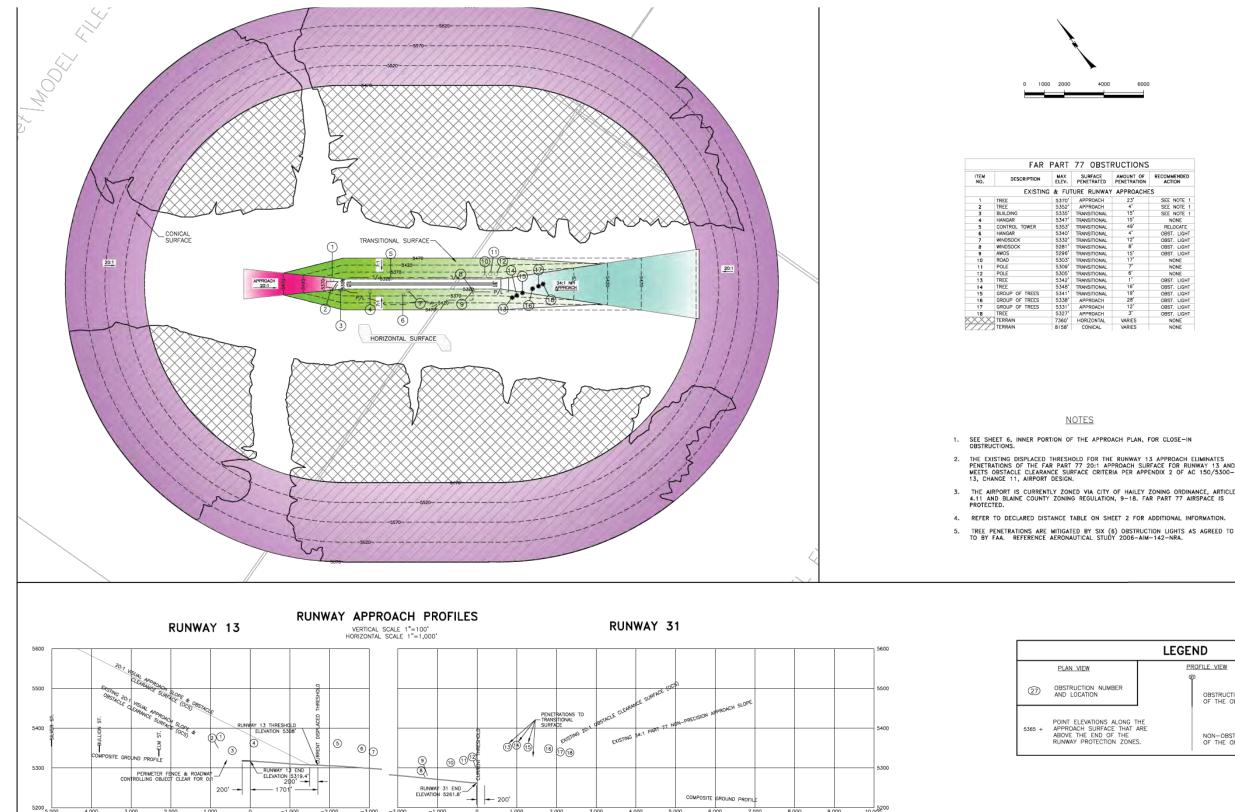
Current SUN PART 77 Airspace Plan
